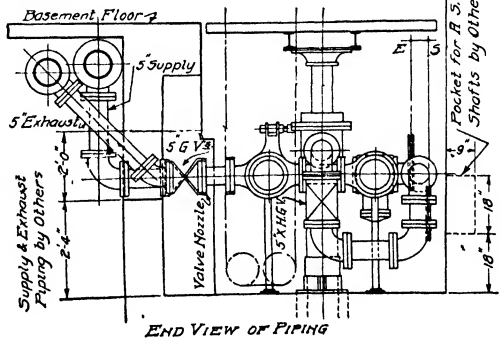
Details of Hydraulic Plunger Elevator Installation
